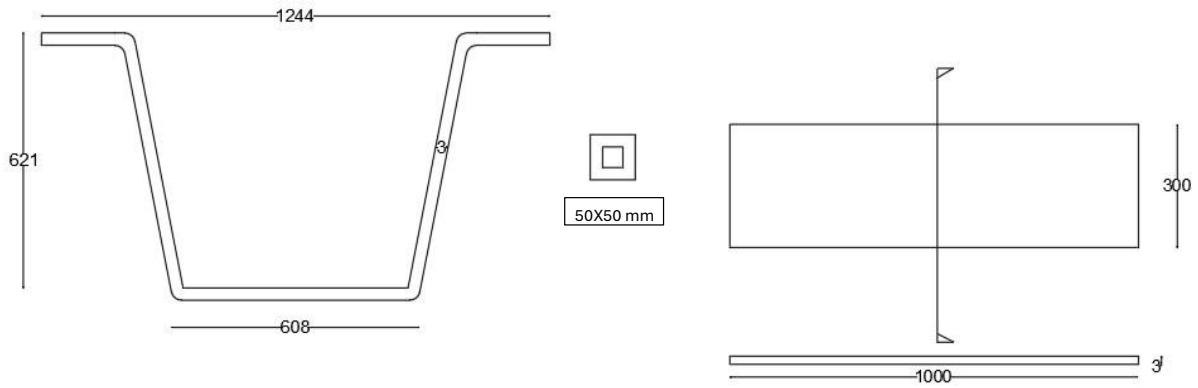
shows geometry and dimensions used for CFS tub girder bridge.
